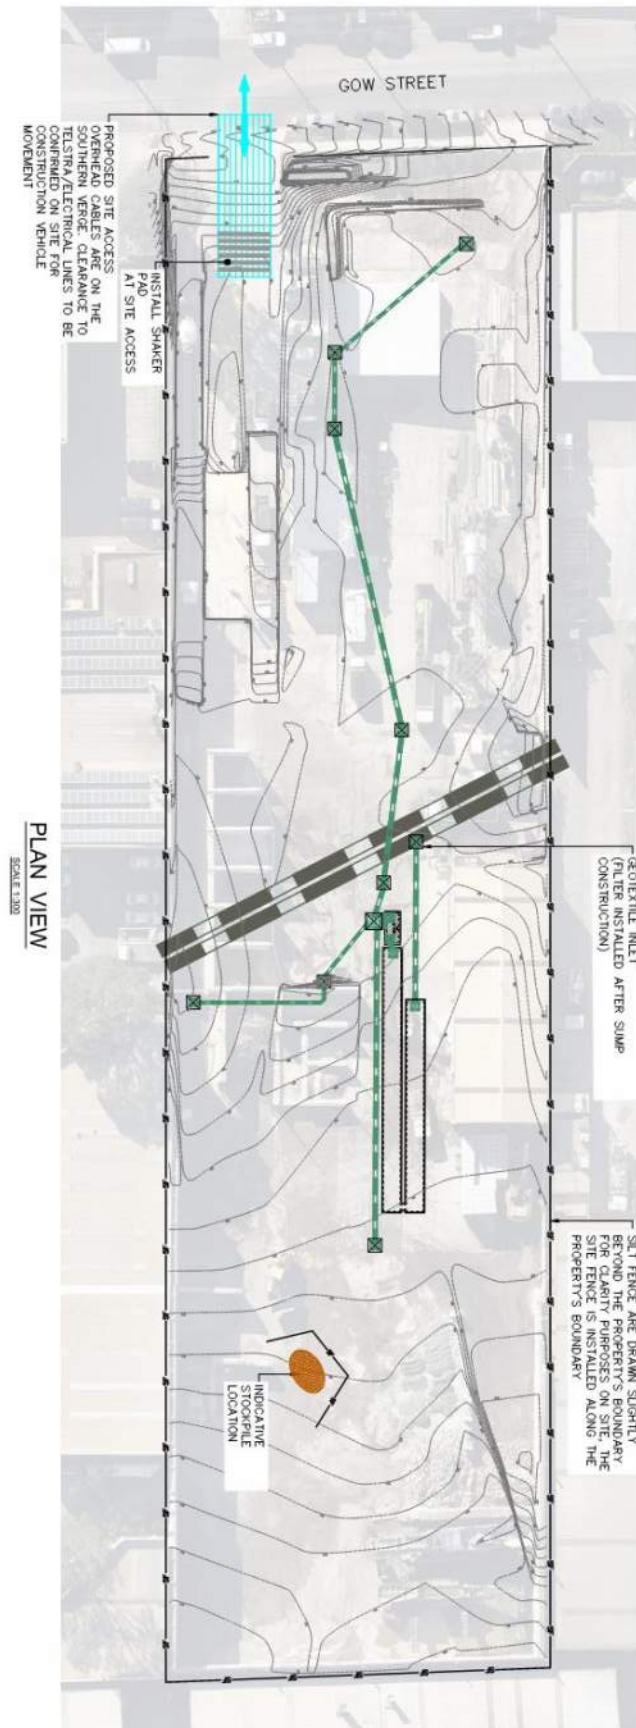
Stormwater Design, Erosion and Sediment Control plan extract
